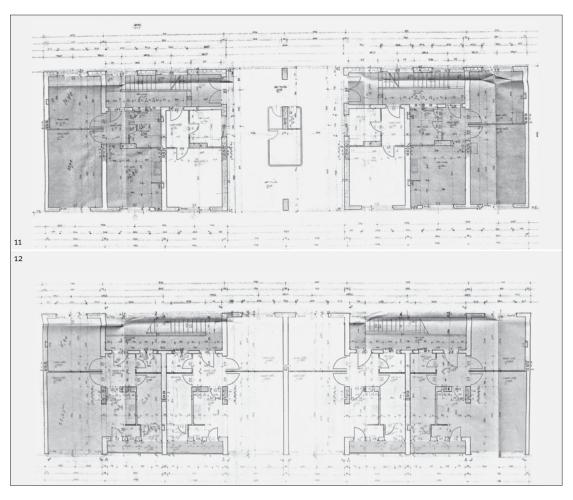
GROUND FLOOR OF RECTANGULAR WIDE SECTION SL. 11. PRIZEMLJE PRAVOKUTNOGA ŠIROKOG DIJELA
